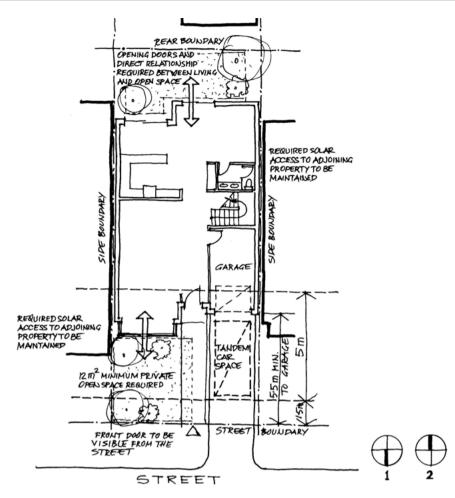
Terrace house layout - north to the street.
